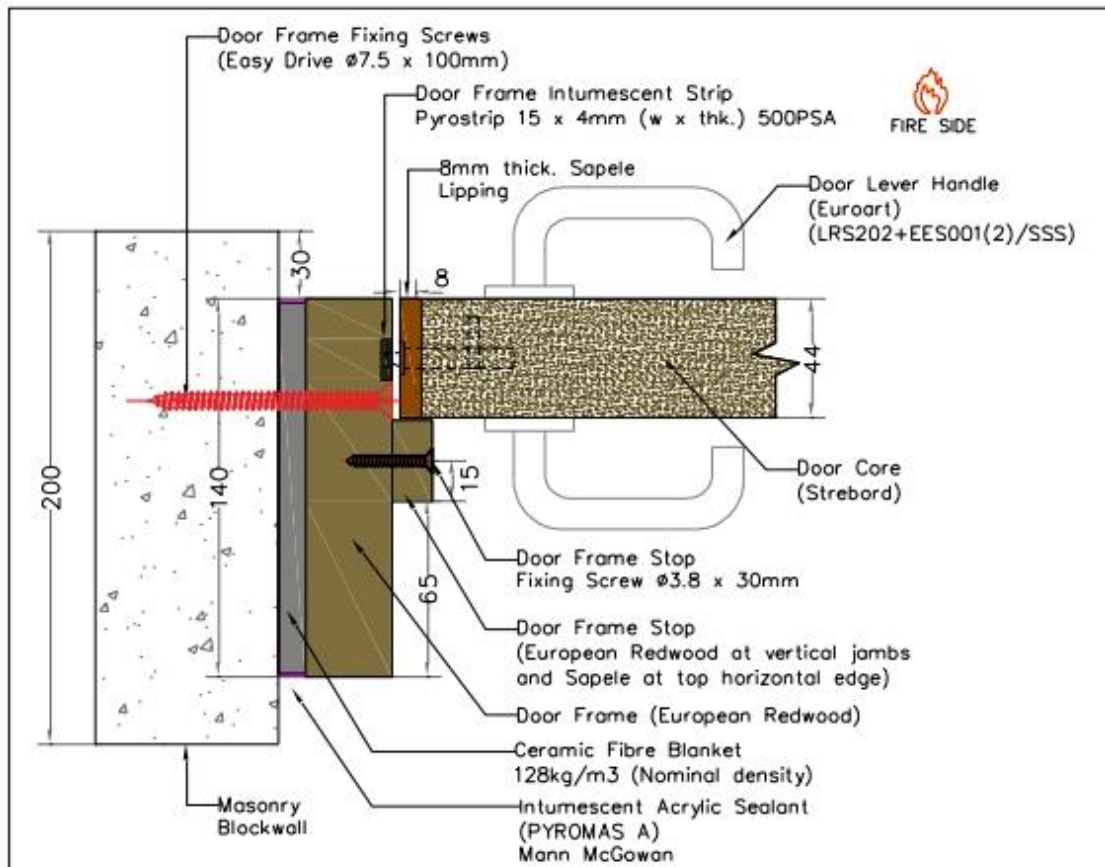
Sectional detail of the top horizontal edge of doorset A (Section 1 from Drawing 4).
